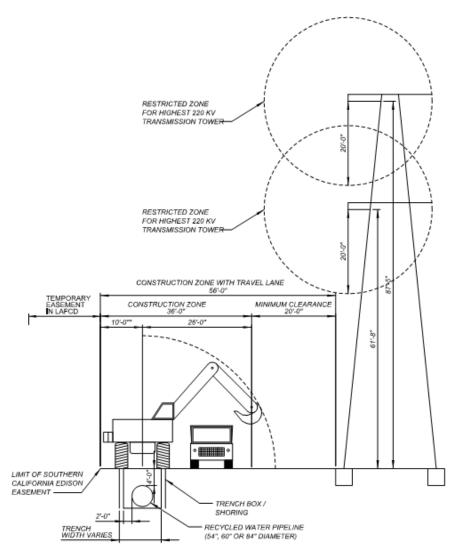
Construction Method 1 – Roadways (Shored Construction)
